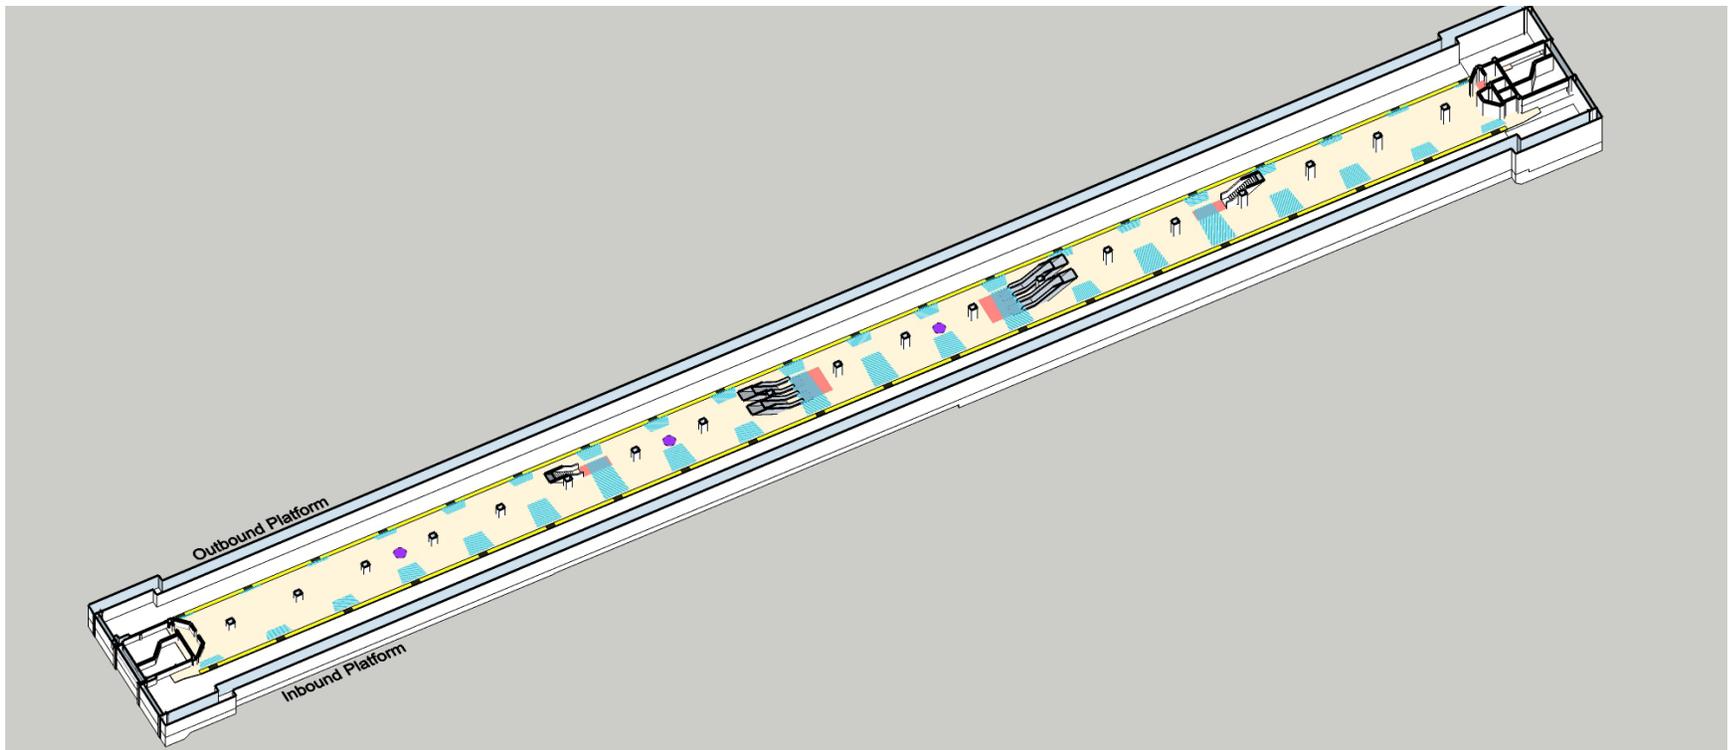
PLATFORM PLAN SURGE SPACES
